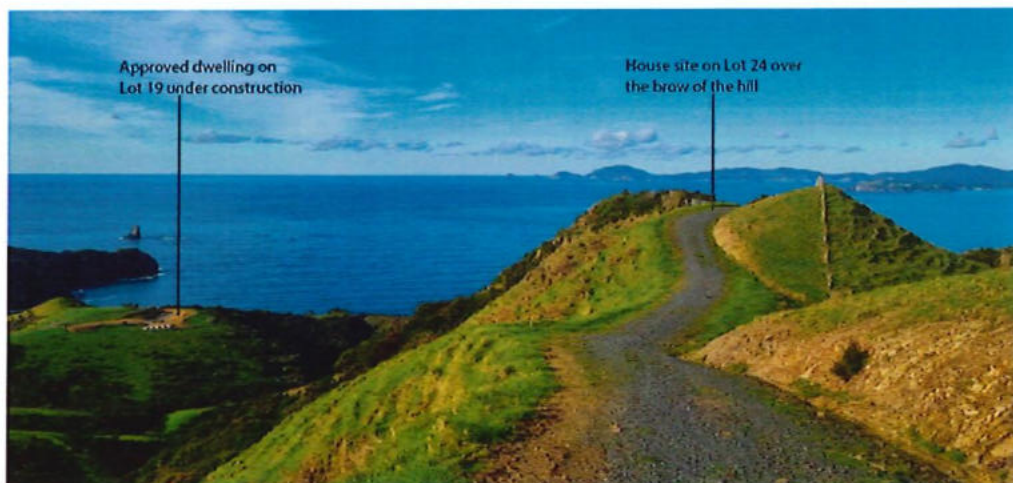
Driveway to the Lot 24 building site which is obscured as it is located over the brow of the hill. An approved house is under construction on adjoining Lot 19.
